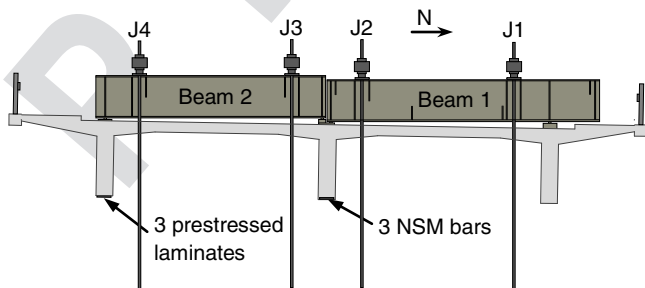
Cross-section and loading setup for the Kiruna Bridge; J1–4 are hydraulic jacks
